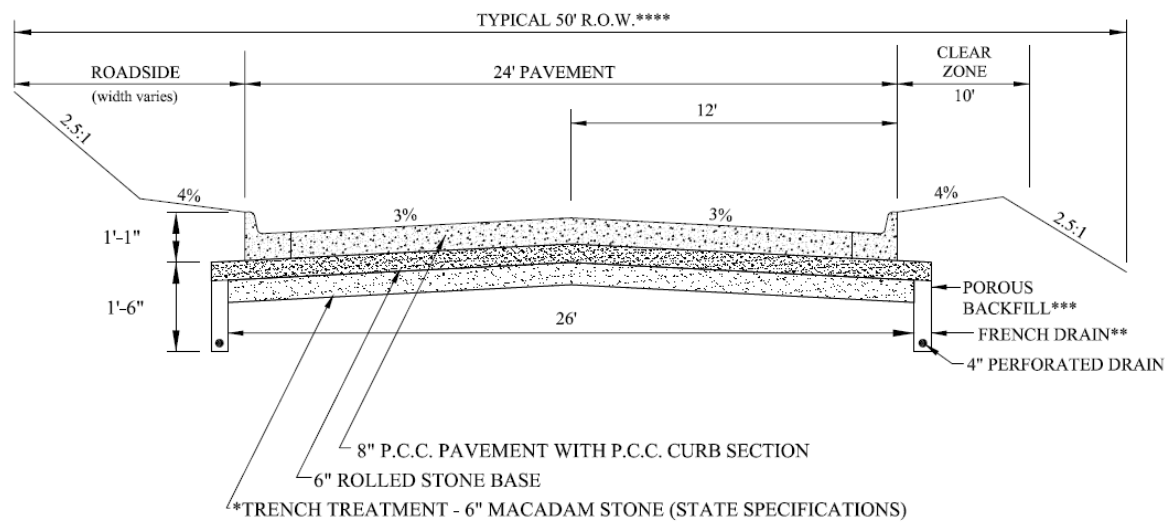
CONSERVATION SUBDIVISION: TYPICAL MINIMUM P.C.C. PAVEMENT - CLOSED DITCH SECTION
